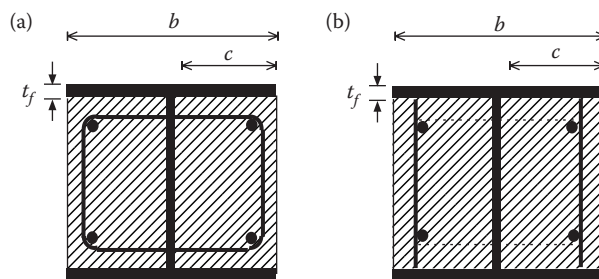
Partially encased composite sections. (a) Cross-section configuration and (b) straight bars welded to flanges.
